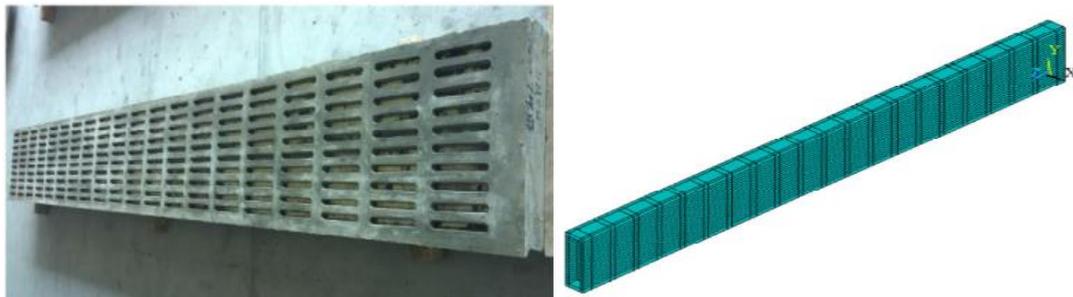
A Concrete Noise Barrier Unit Plate B Simplified finite element model
